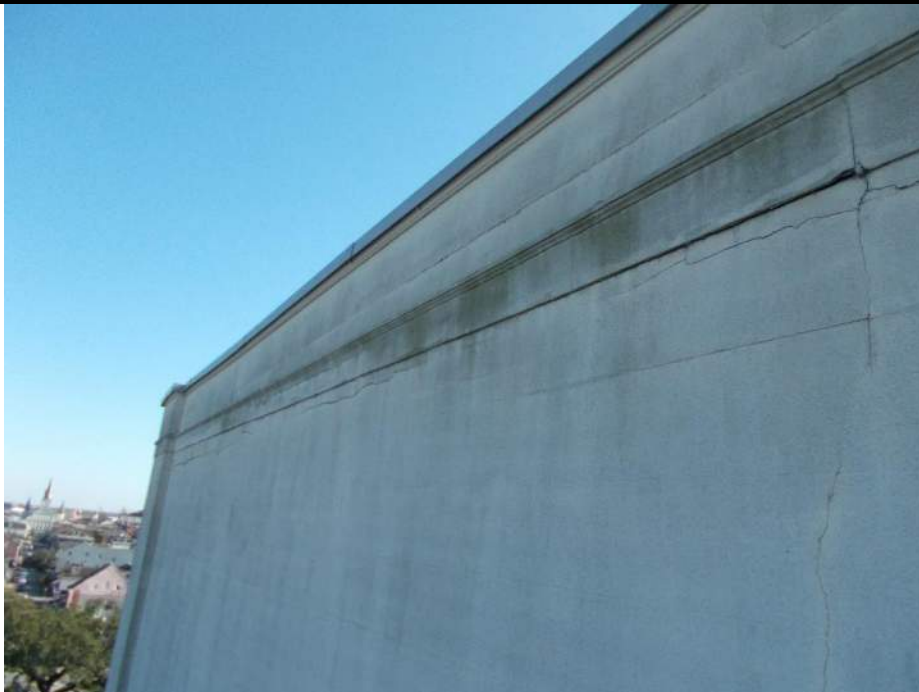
Stage House. Cracking in Existing Plaster.
